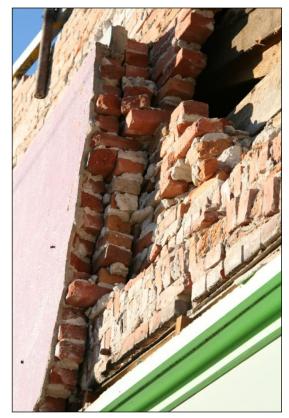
Detail of bricks in the front wall of the Capitol Club. Some widely spaced cross-course bricks can be seen.
